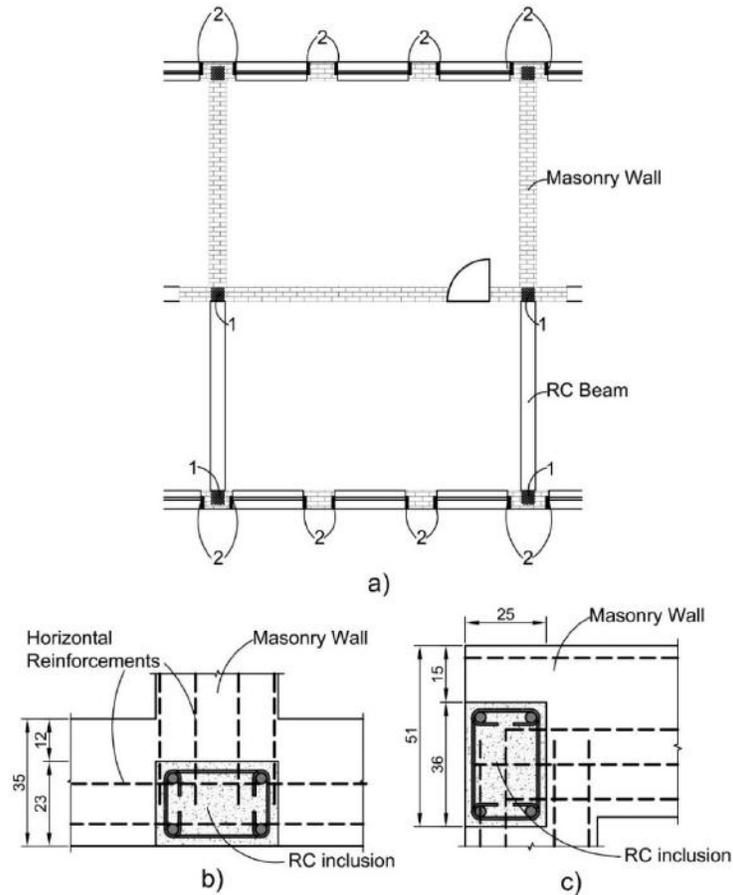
A partial floor plan showing vertical RC inclusions in masonry walls and reinforcement: 1- Level 1 inclusion and 2 – Level 2 inclusion.
